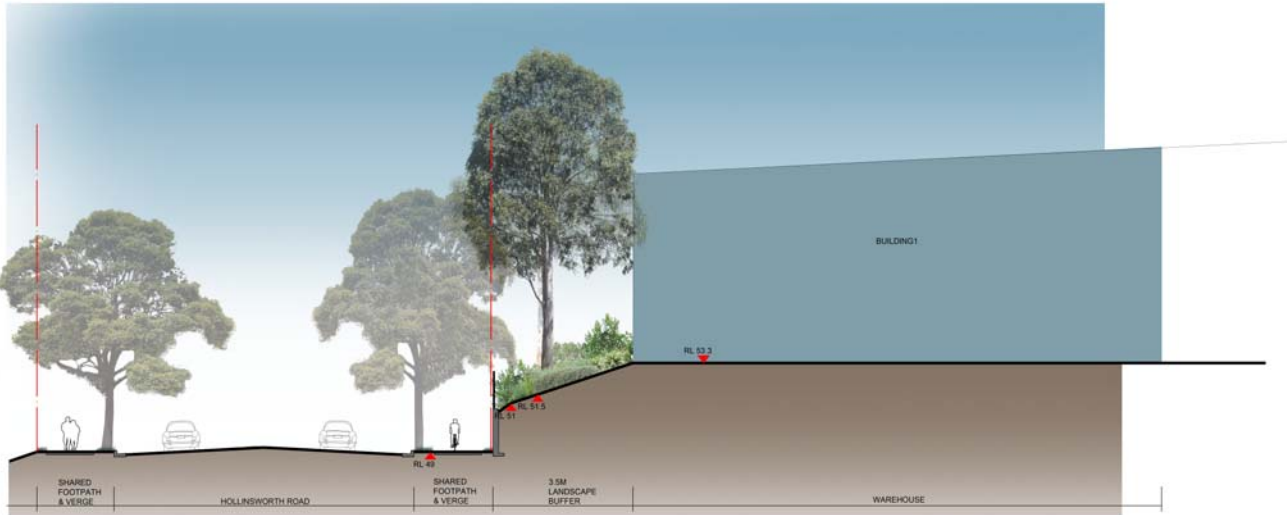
SECTION THROUGH THE HOLLINSWORTH ROAD BUFFER (BUILDING 1)
